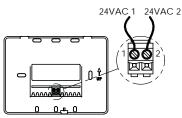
TW205/TW206 Thermostat backplate, mounting screws.
